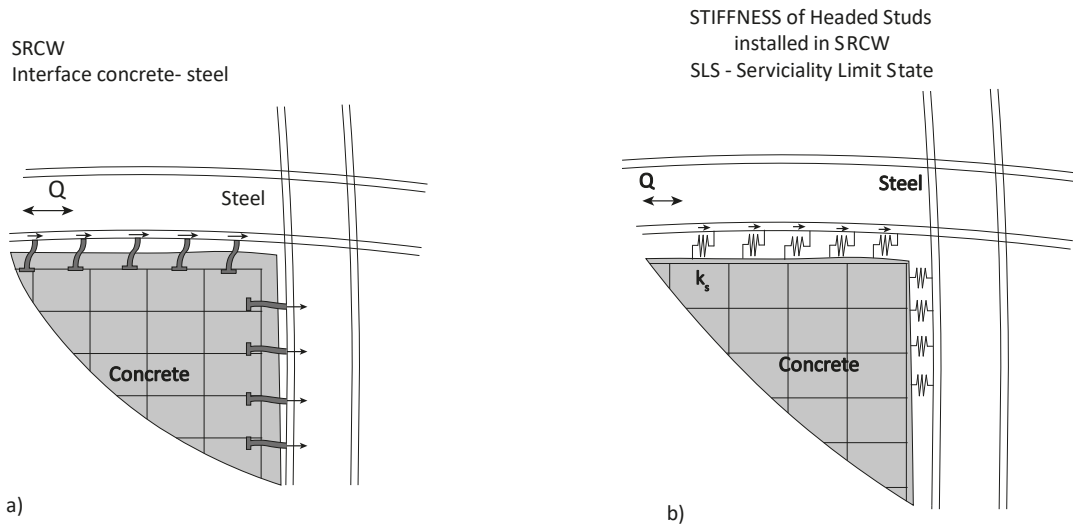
a) Detail of deformed shape of SRCW, b) Spring which models the interaction between concrete and steel in SRCW.
